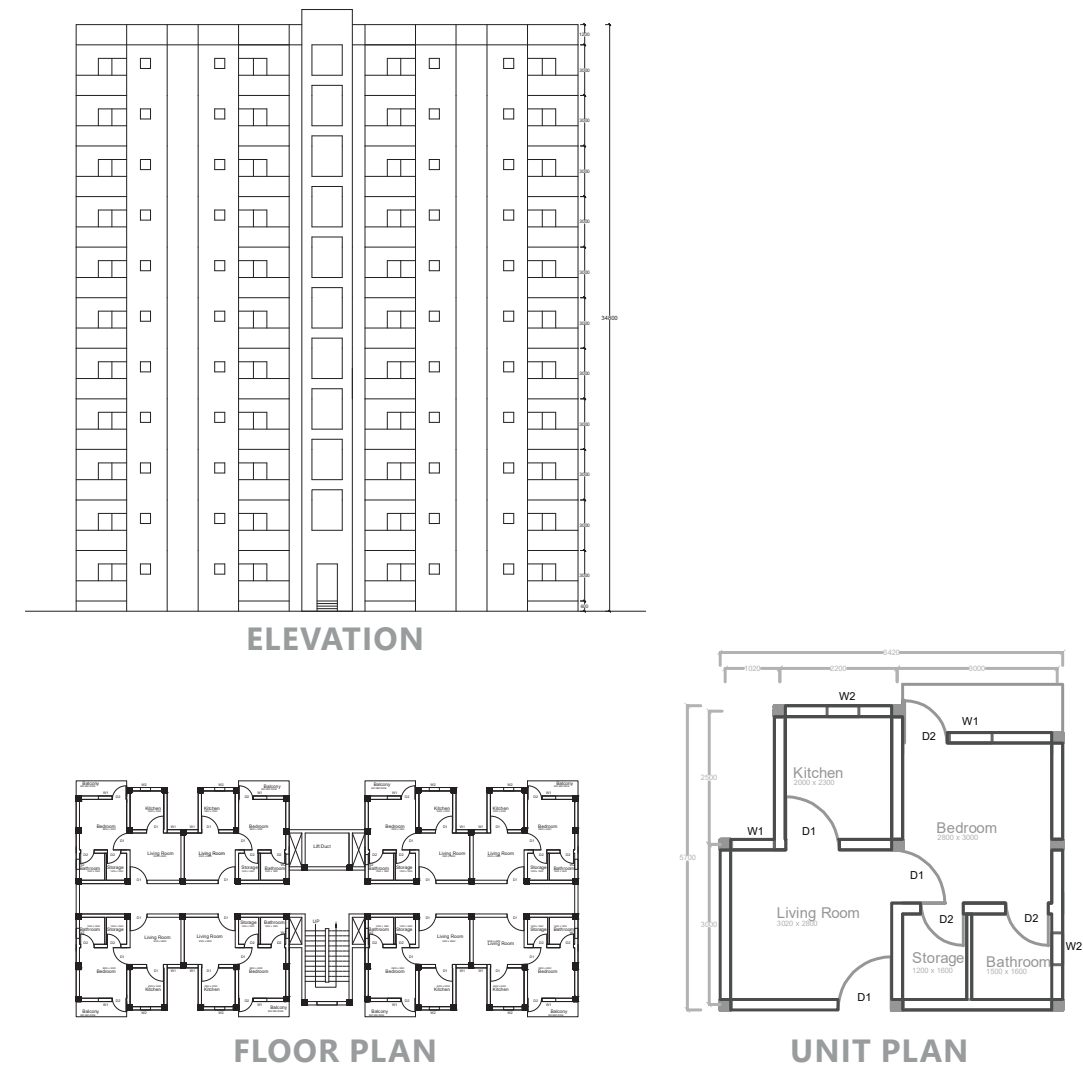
Typical plan and section for a mass affordable housing complex of 100 units.
